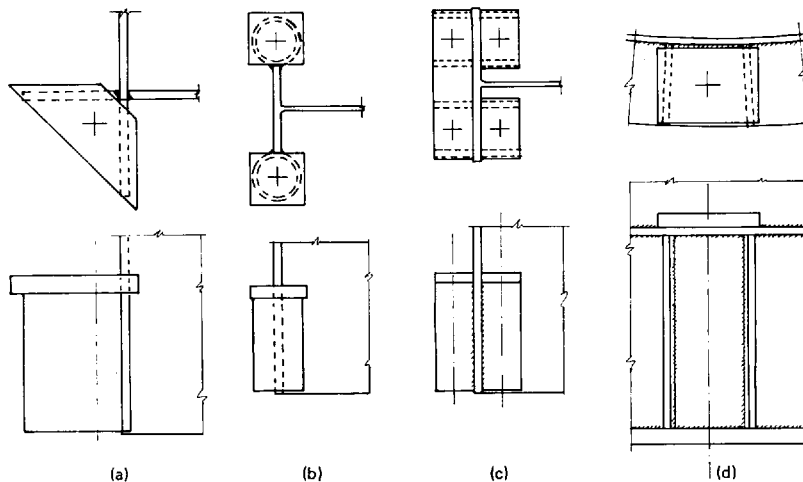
Holding-down details for column bases. (a) Box column; (b) UB section (moderate tension); (c) UB or UC section (high tension); (d) cylindrical column
